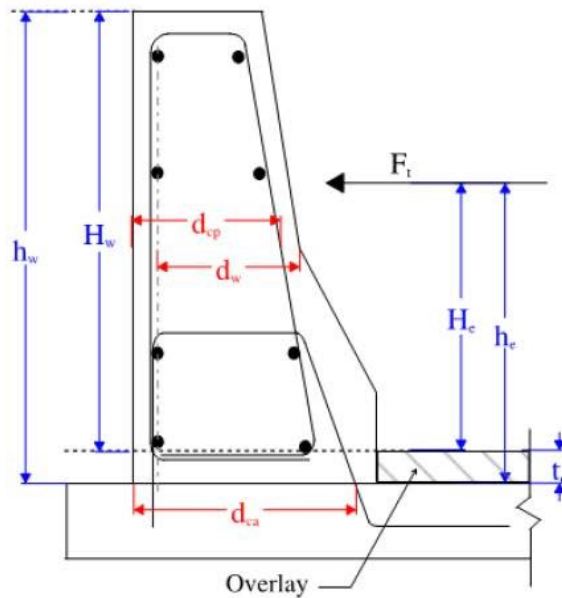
Sketch of Concrete Wall/Parapet Showing Input Variables
